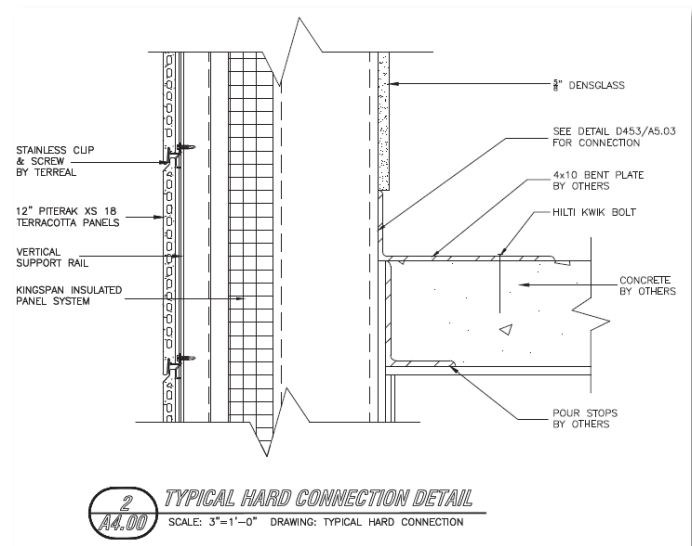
Typical Connection for Prefabricated Terra Cotta Wall Panels, provided by Wyatt Inc.
